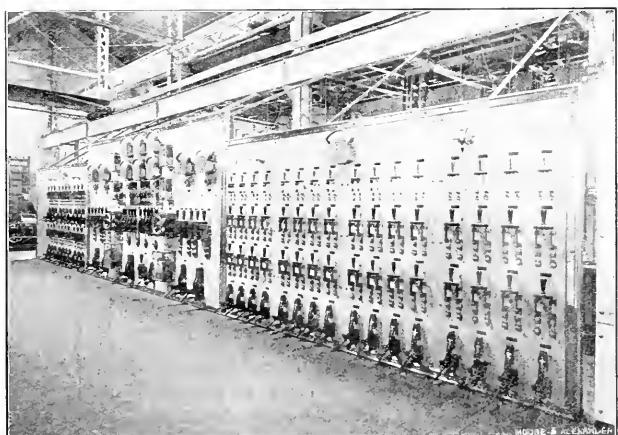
WESTINGHOUSE SWITCHBOARD, FRONT VIEW.—PARK ROW OFFICE BUILDING, NEW YORK CITY.
